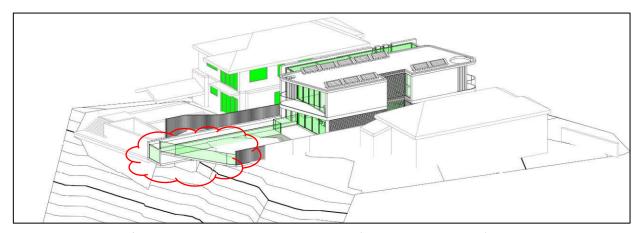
Location of cantilevered structures clouded red. (Source: OROSI, 2021)
